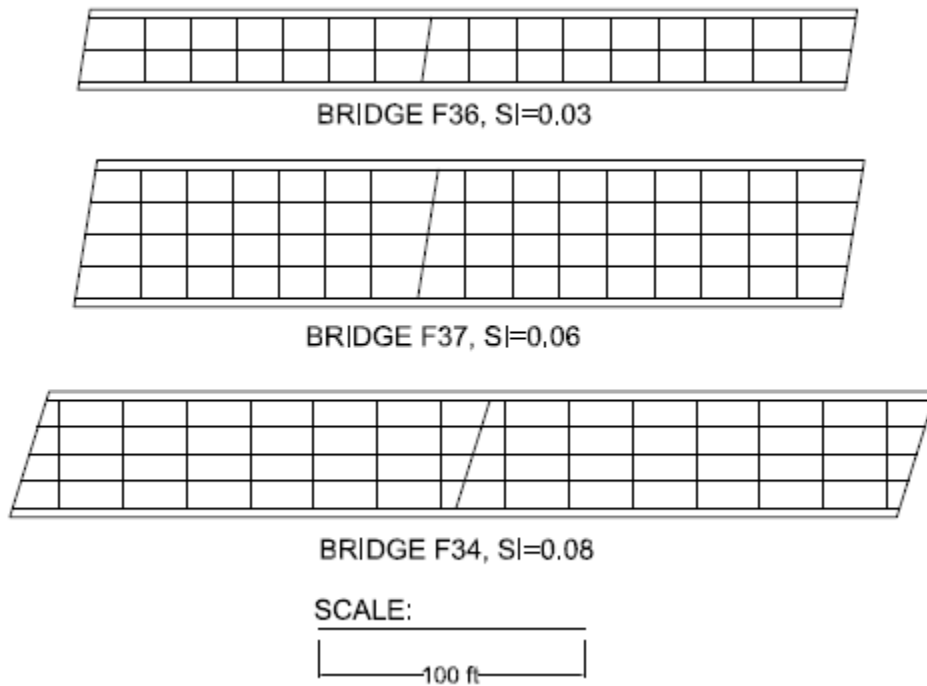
Other two-span continuous bridges having contiguous cross-frame arrangement.
